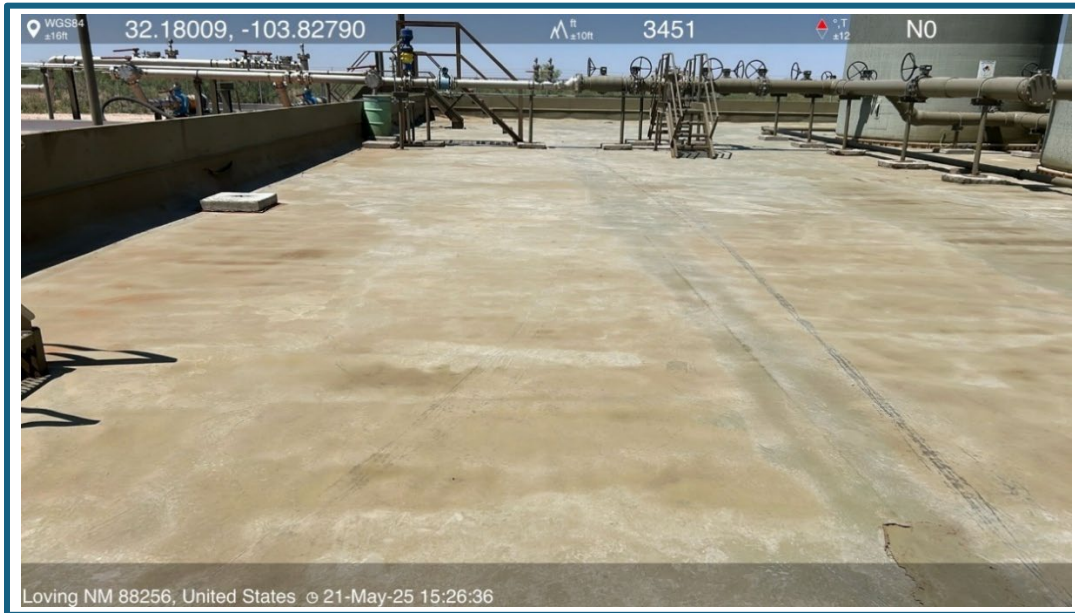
/21/2025	Direction Facing	north	Photo 3
